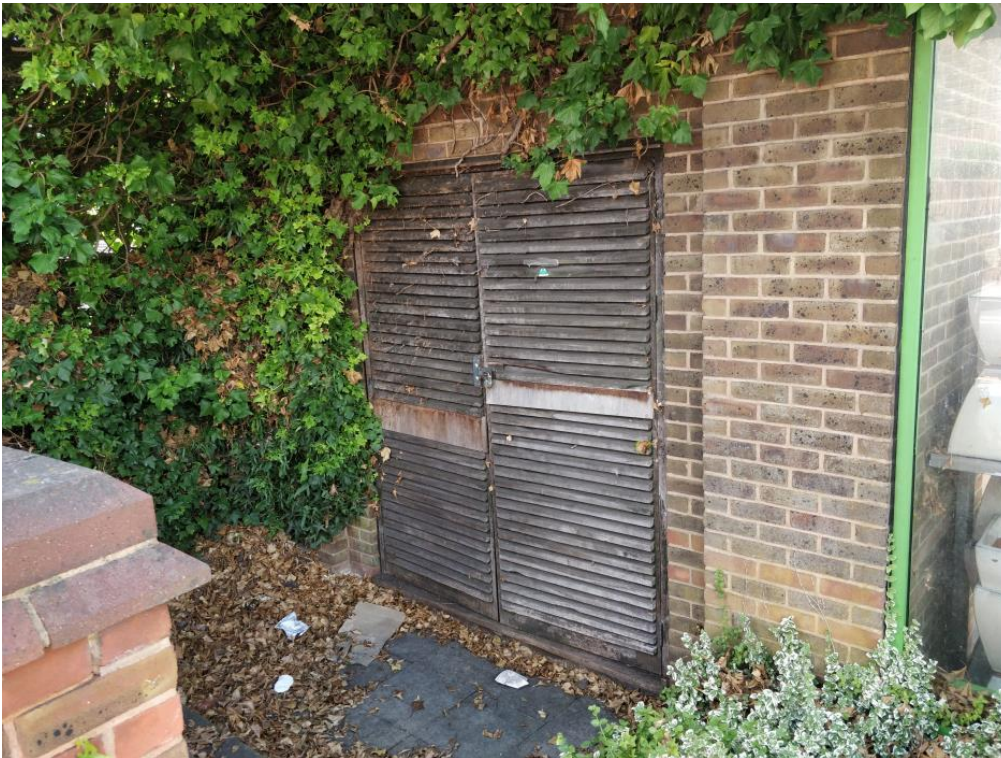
Brick structure assumed to be occupied by Southern Gas Network
